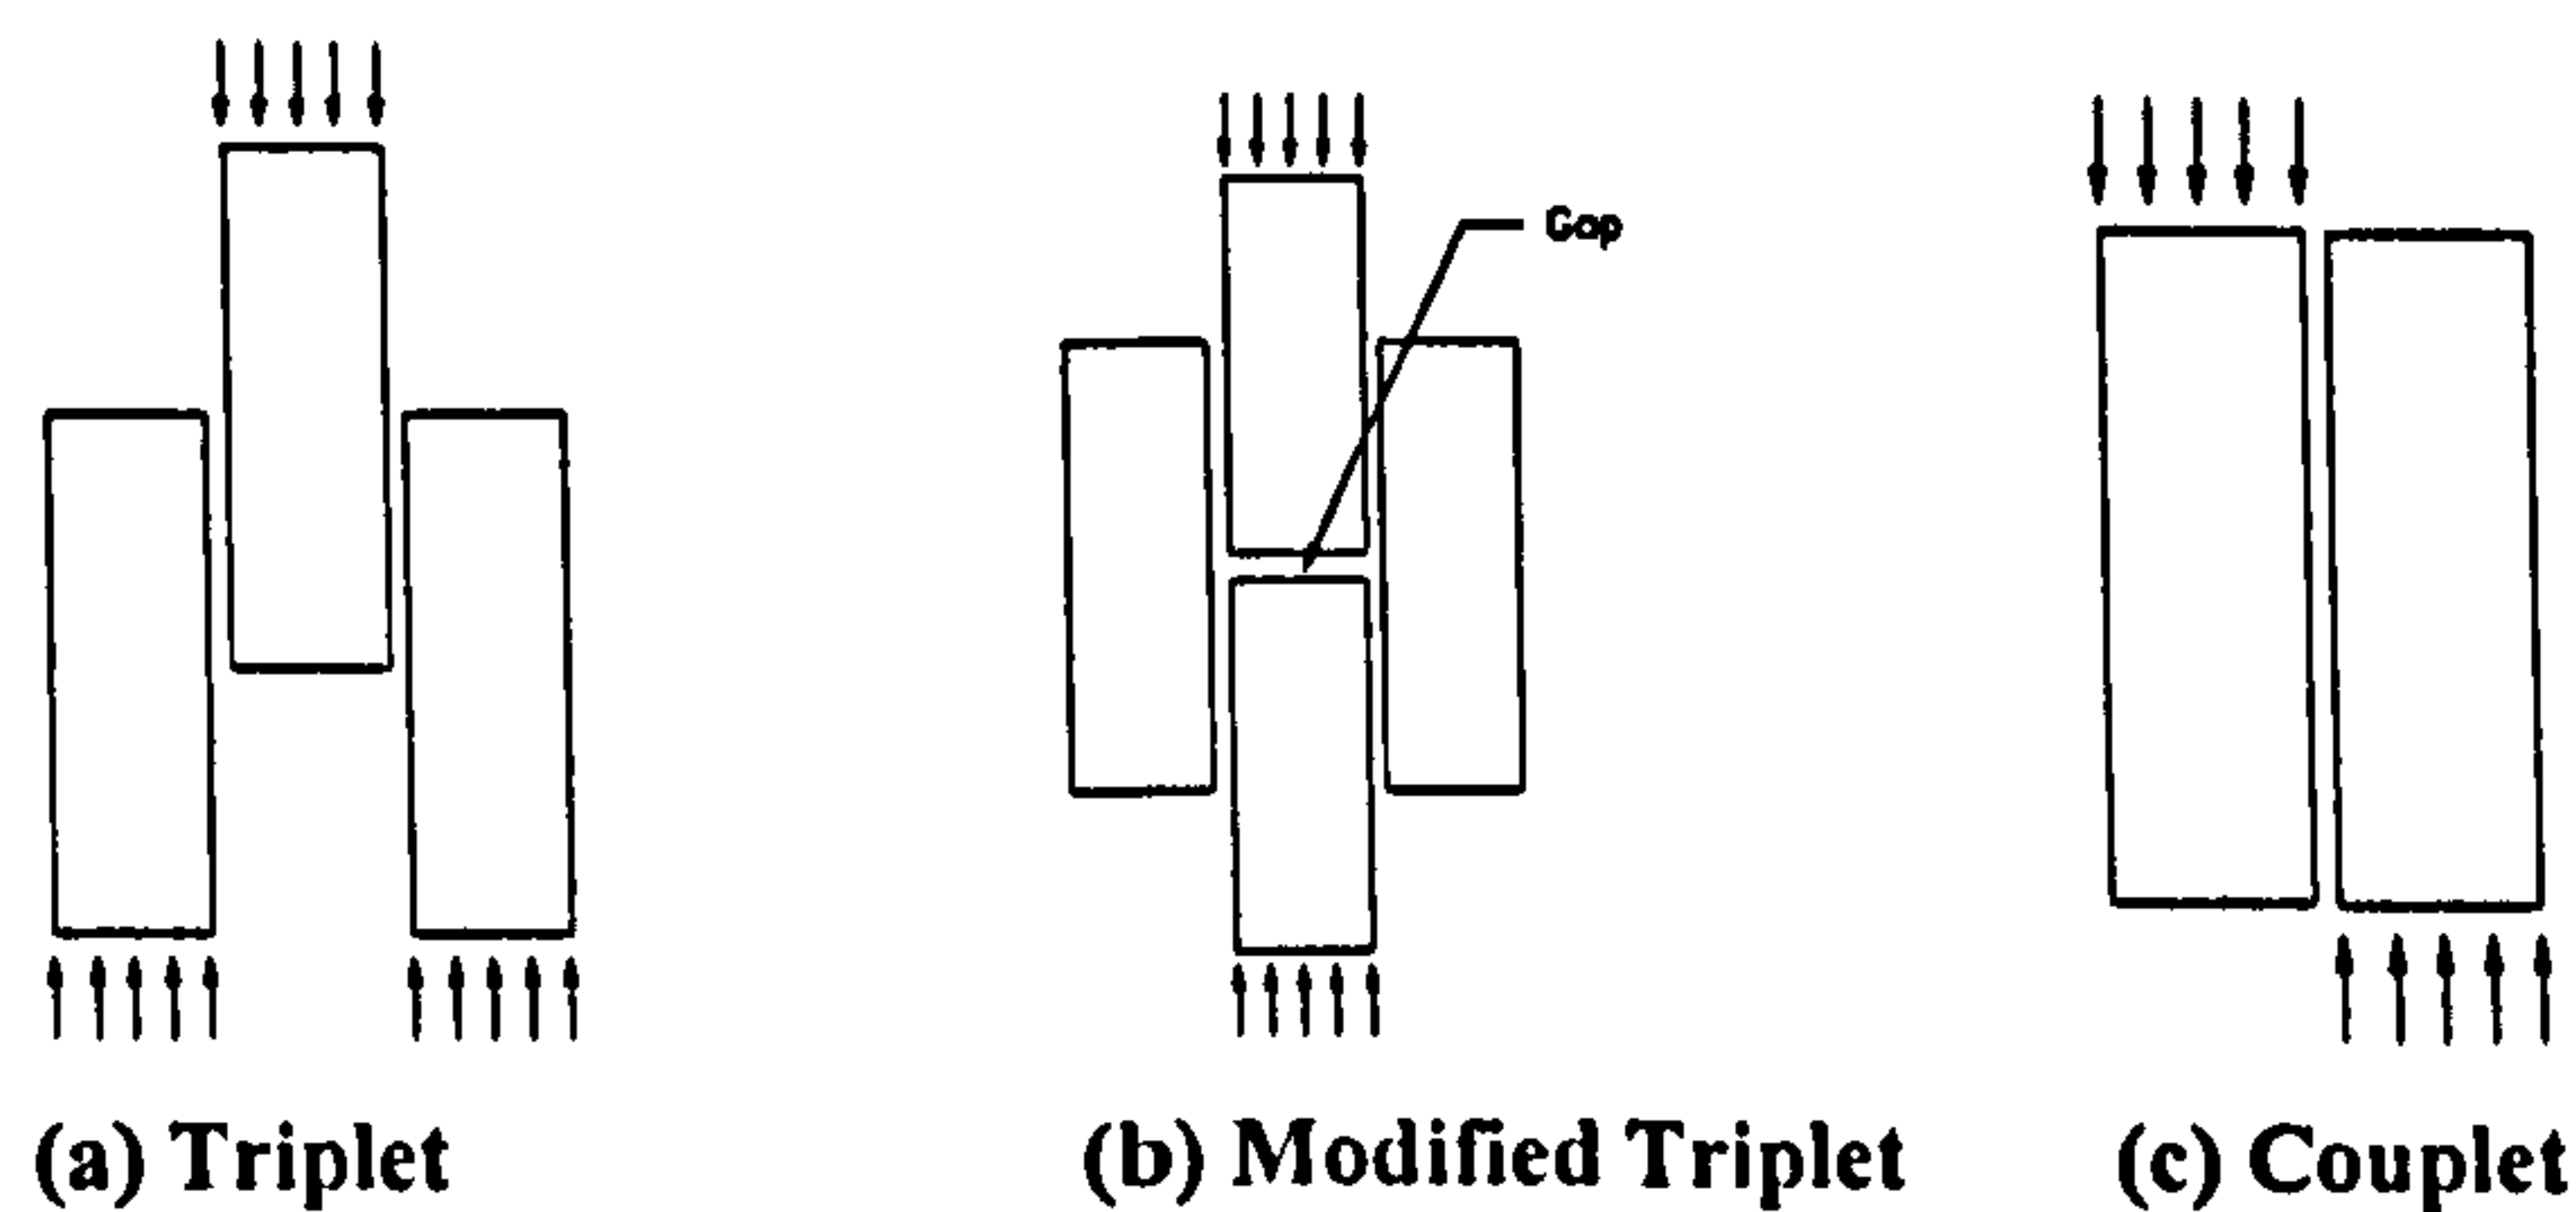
Shear Test Methods For Brickwork Masonry
